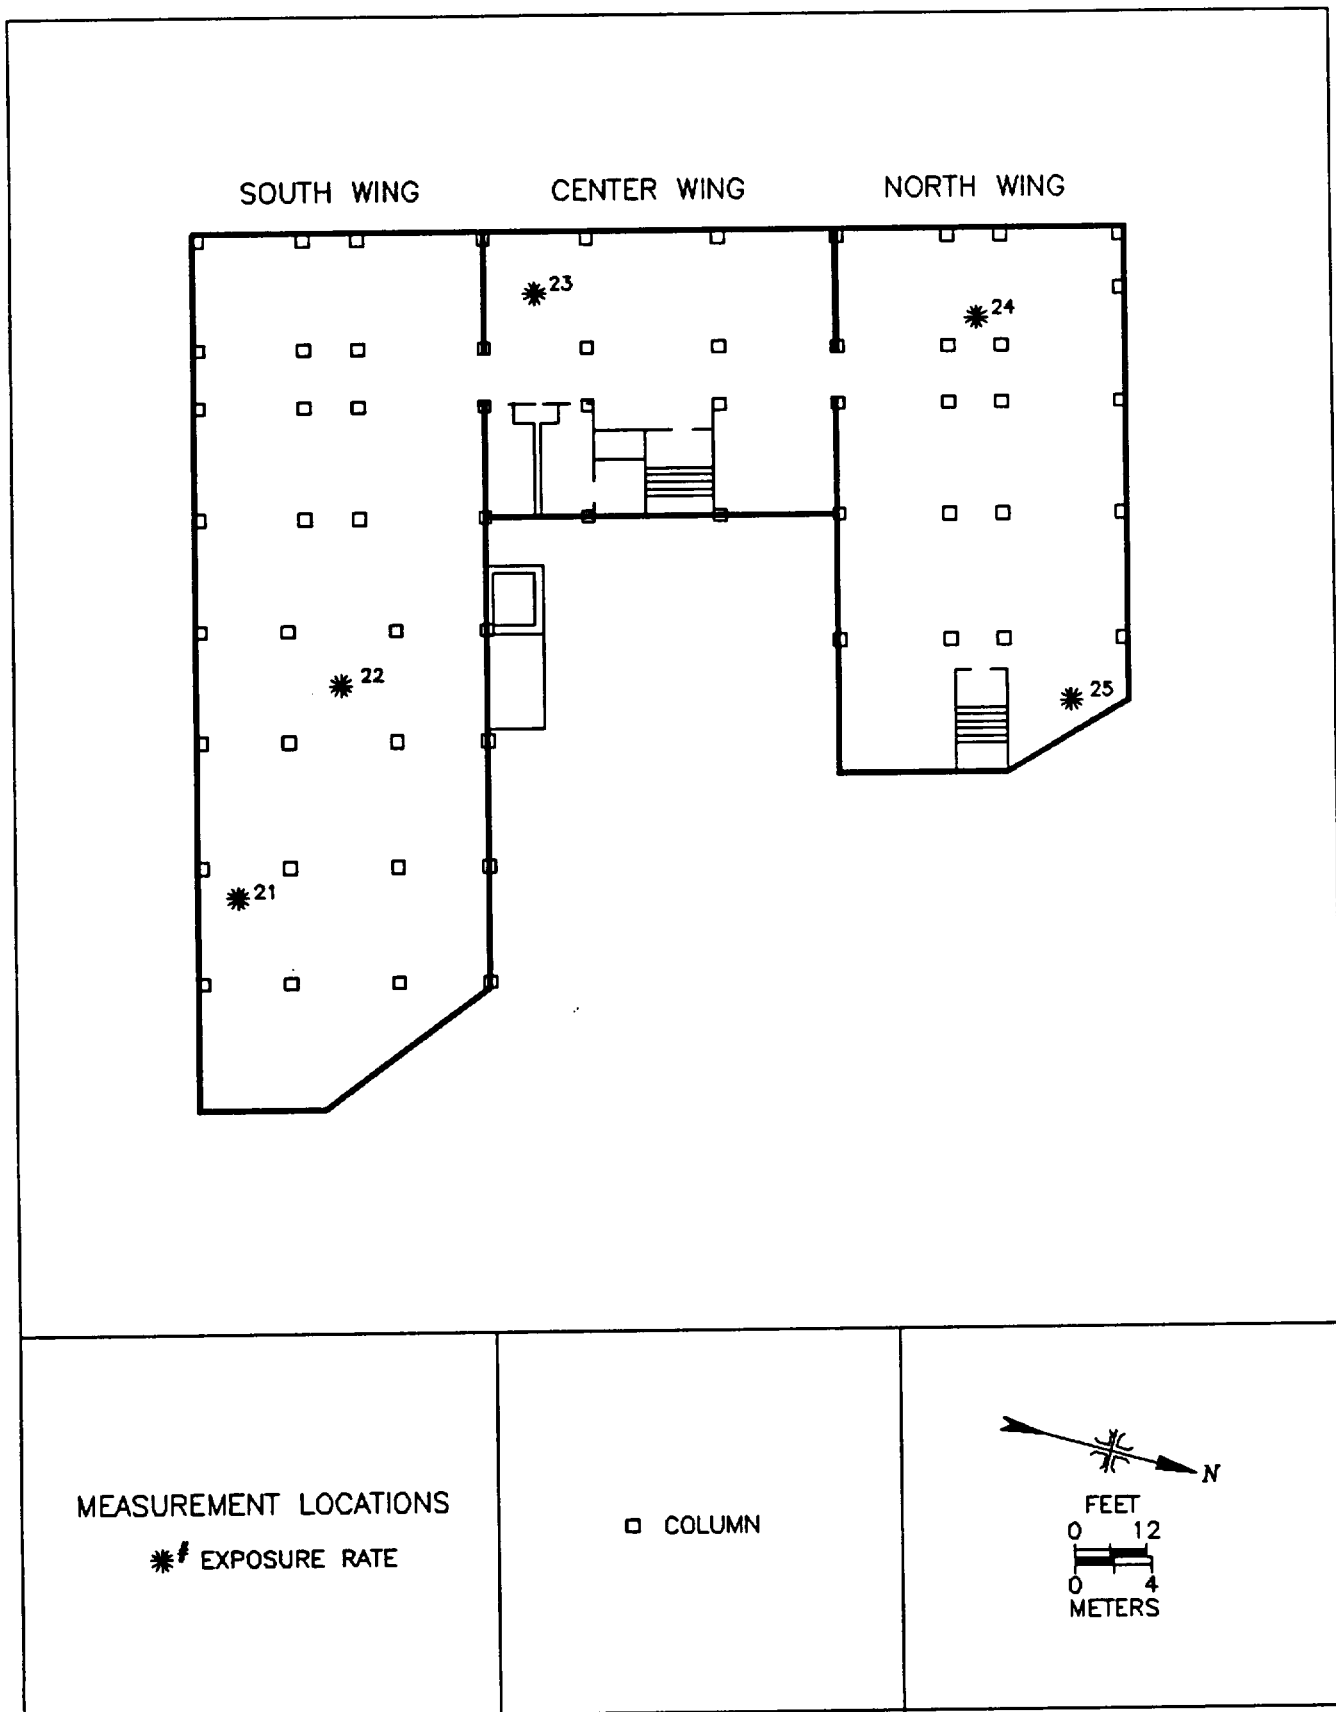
Building 7, Fifth Floor — Exposure Rate Measurement Locations
